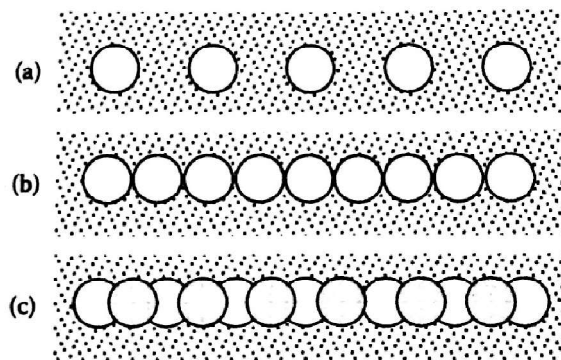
Plan view through typical wall configurations: (a) intermittent (b) contiguous (c) secant (from Clayton et al. 2013)
